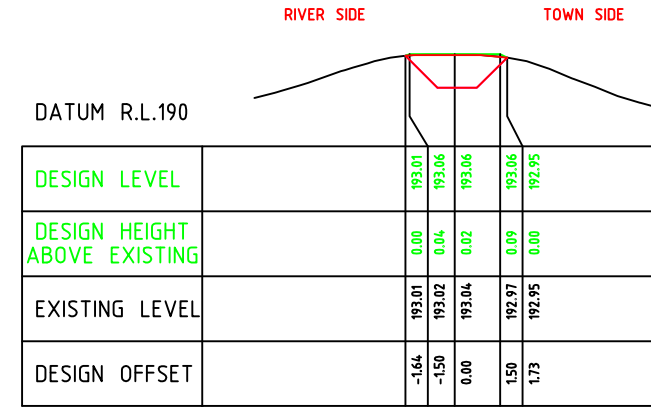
DETAILS OF TOWN LEVEL UPGRADE REQUIREMENTS
